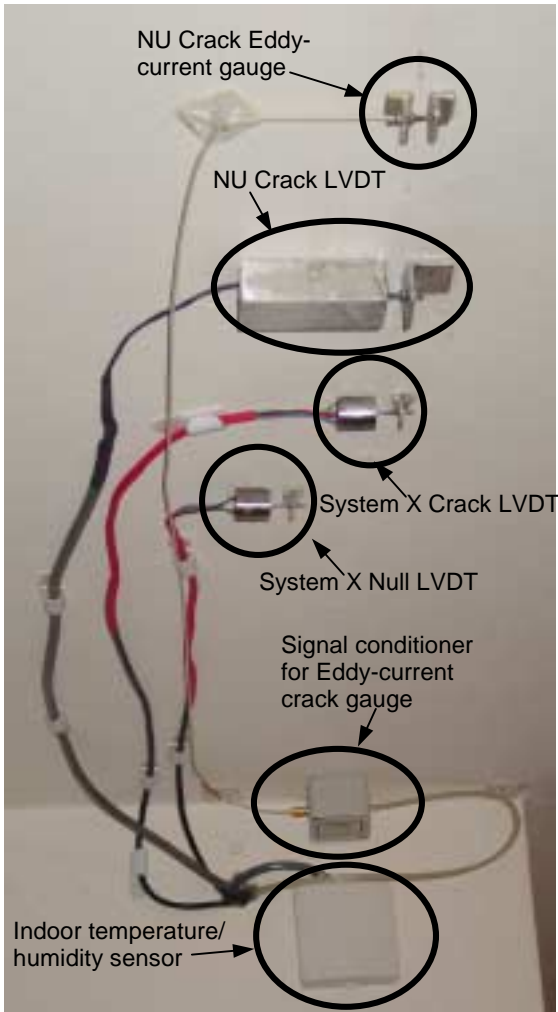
Sensors on ceiling crack at field test site, house near quarry, Franklin WI.
